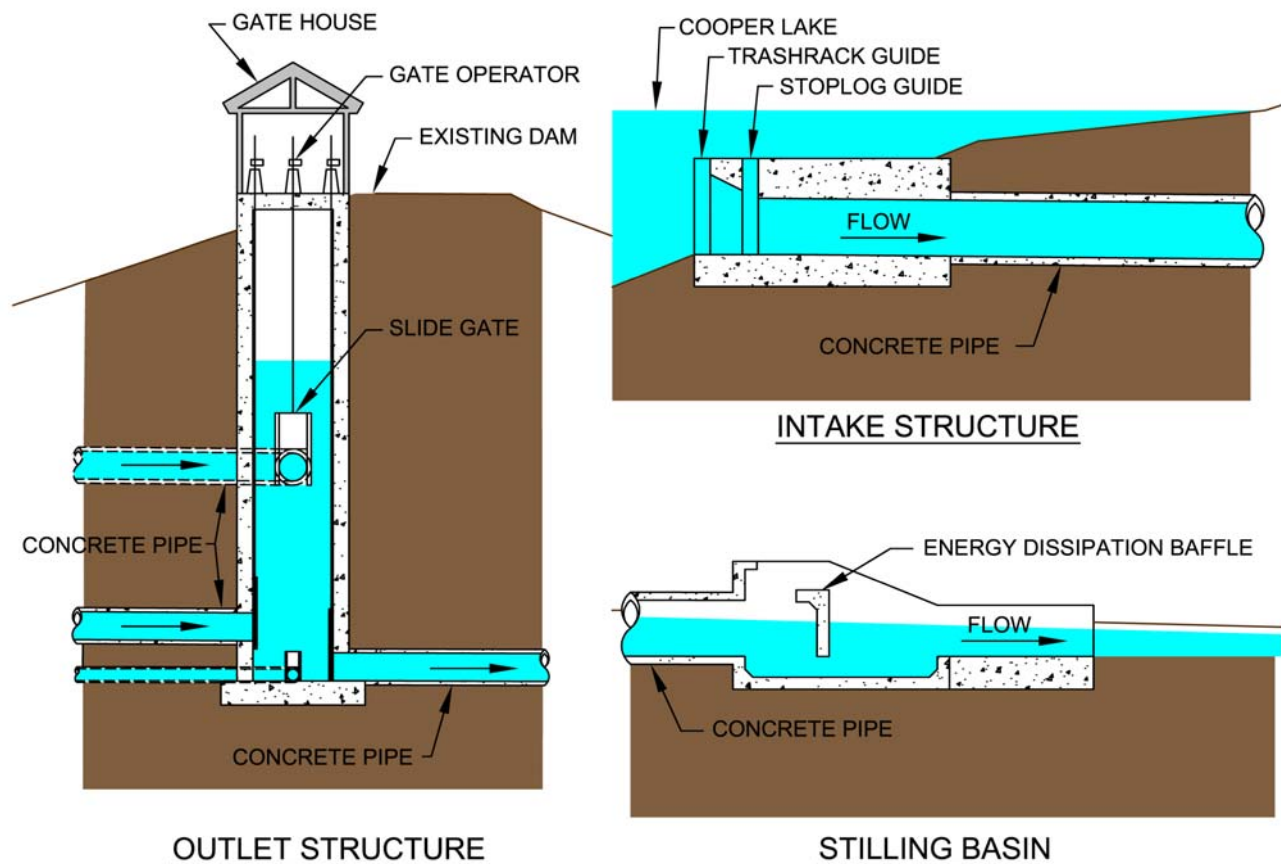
Components of Gravity Outlet Structure with 2 Pipes
